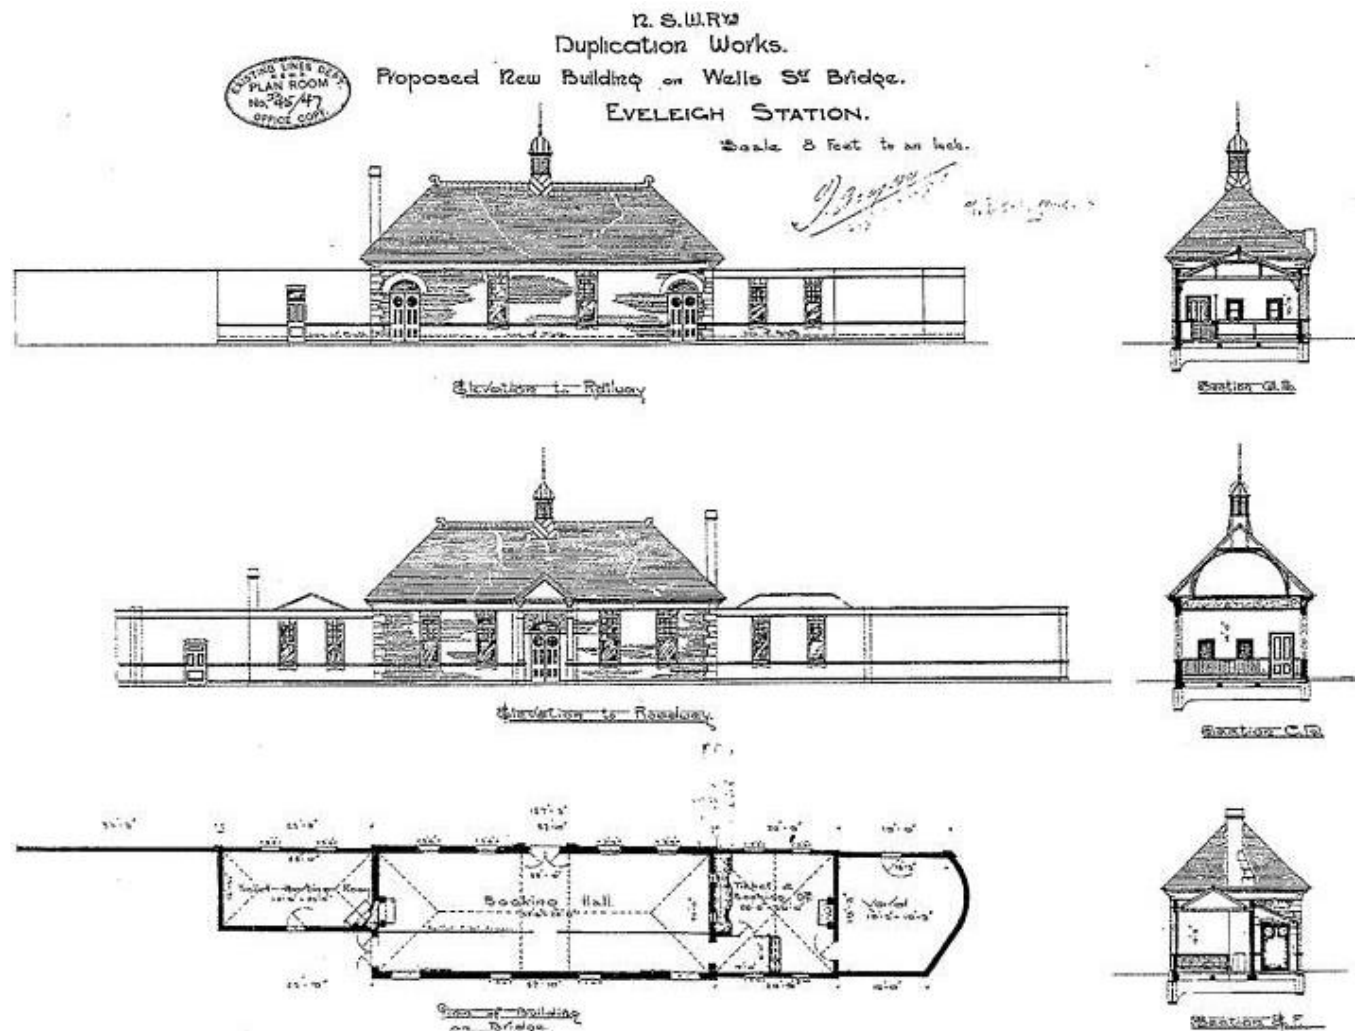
Proposed new building - Wells Street Bridge, Eveleigh Station, c1891. Source: State Rail Archives, State Records
